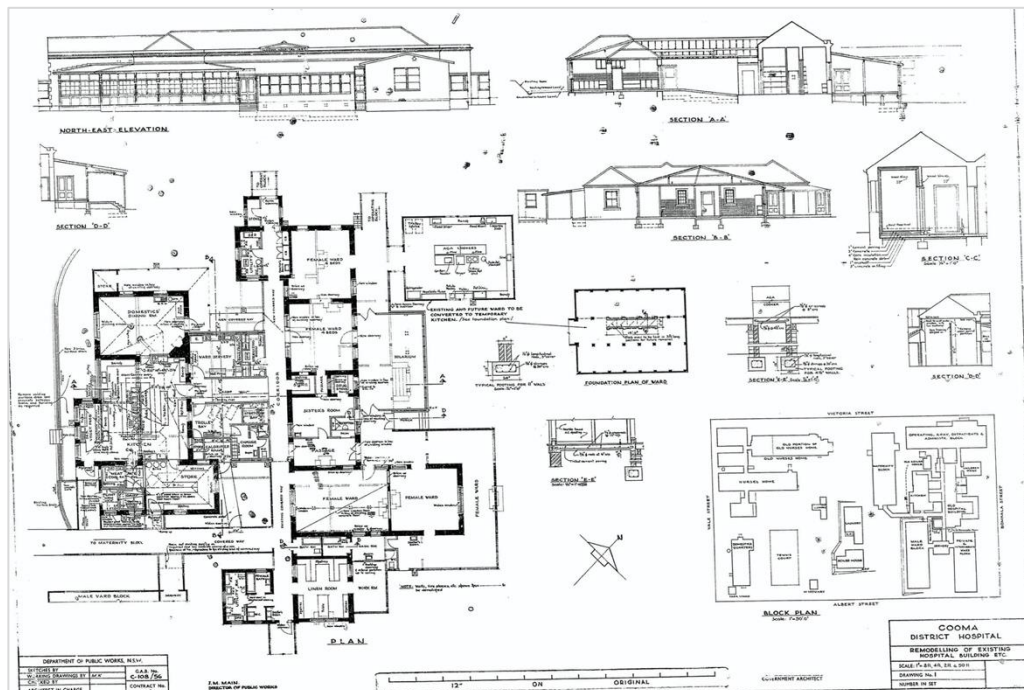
c1950s drawing for "remodelling of existing hospital building", undated and unsigned, showing planned alterations to the hospital. These were likely not carried out as shown. (Source: NSW Plan Services (PWA), PH52-32 – Cooma Hospital – Existing Building Remodelling – Site & Floor Plan – Elevations & Sections)
